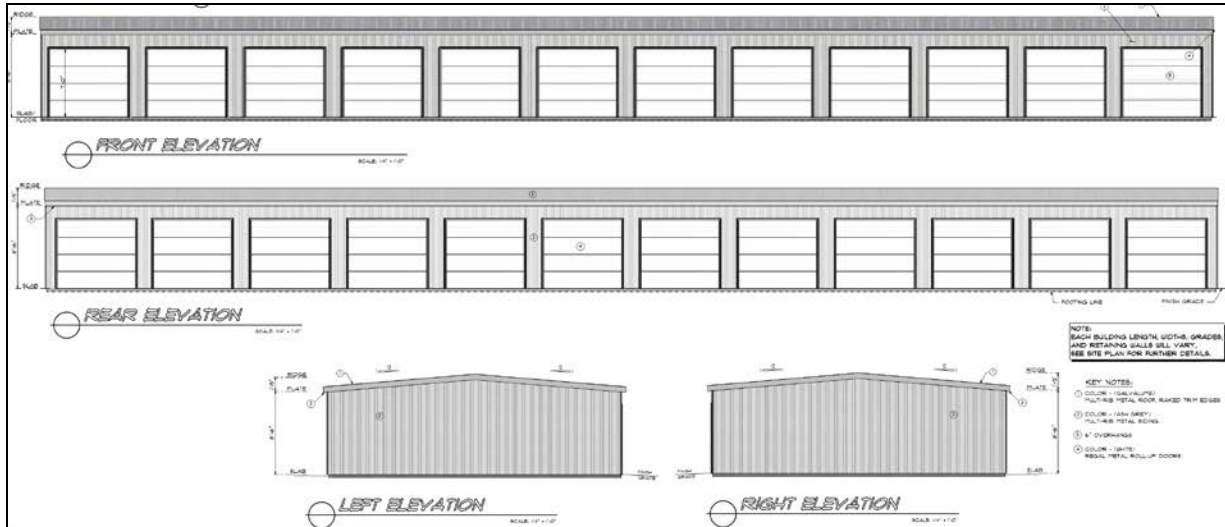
Buildings 1, 2, 6, 8, 9, and 14 Elevations
